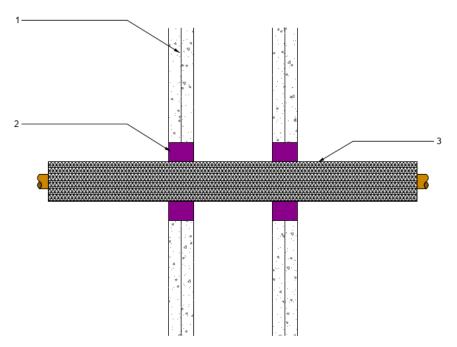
2hr minimum 116 mm flexible wall FRL -/120/120 and Rigid walls FRL - /120/120 and FRL 120/120/120. Typical arrangement of insulated metal pipes protected with BOSS FireMastic-HPE sealant finished flush with the wall
